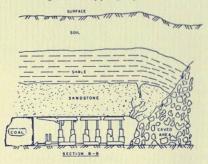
Cross-section View of Longwall Stripping System Along Highwall
